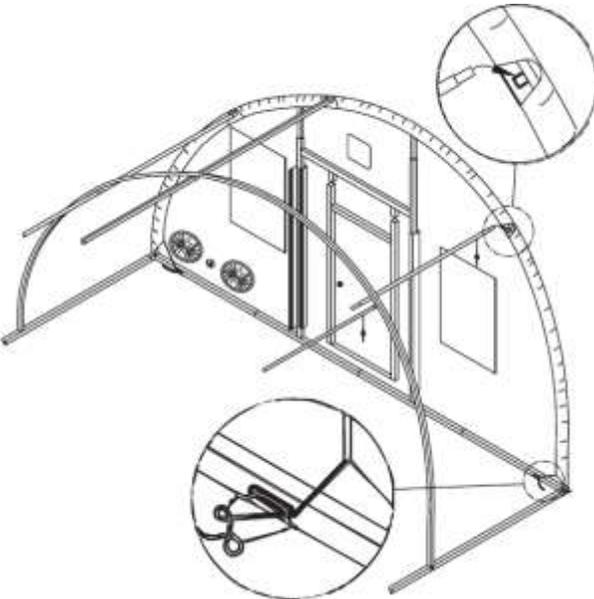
Sliding Header Stubs into Top of Door Frame.
